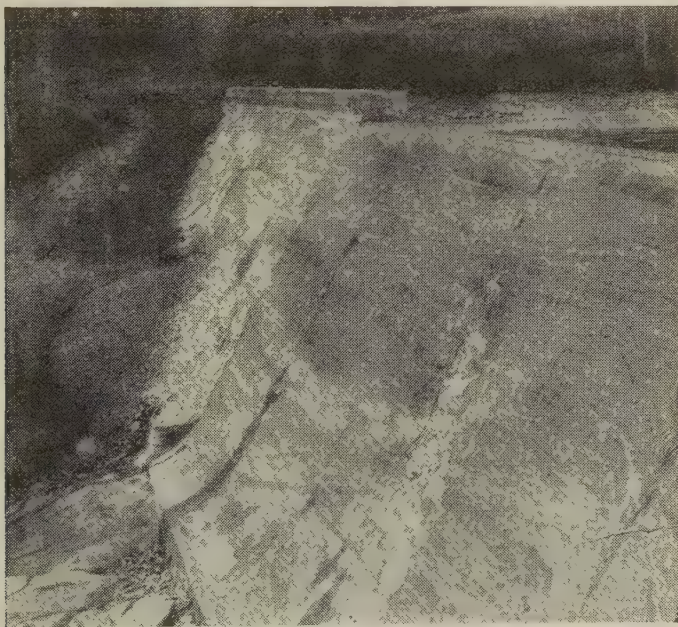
A DOWN STREAM FACE BETTER THAN IT LOOKS
